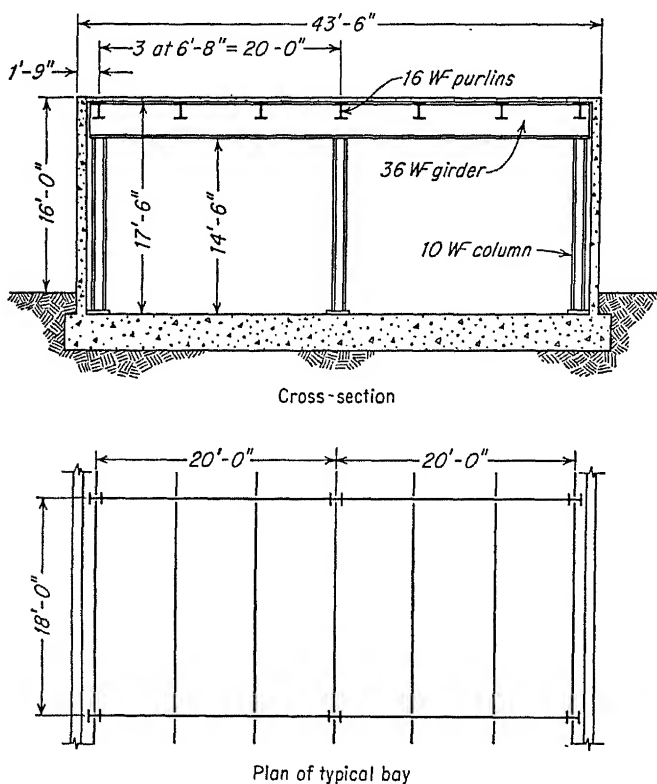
Plan and section of steel-frame building for 10 psi from an 18-KT bomb [Chap. 1, Ref. 8].
